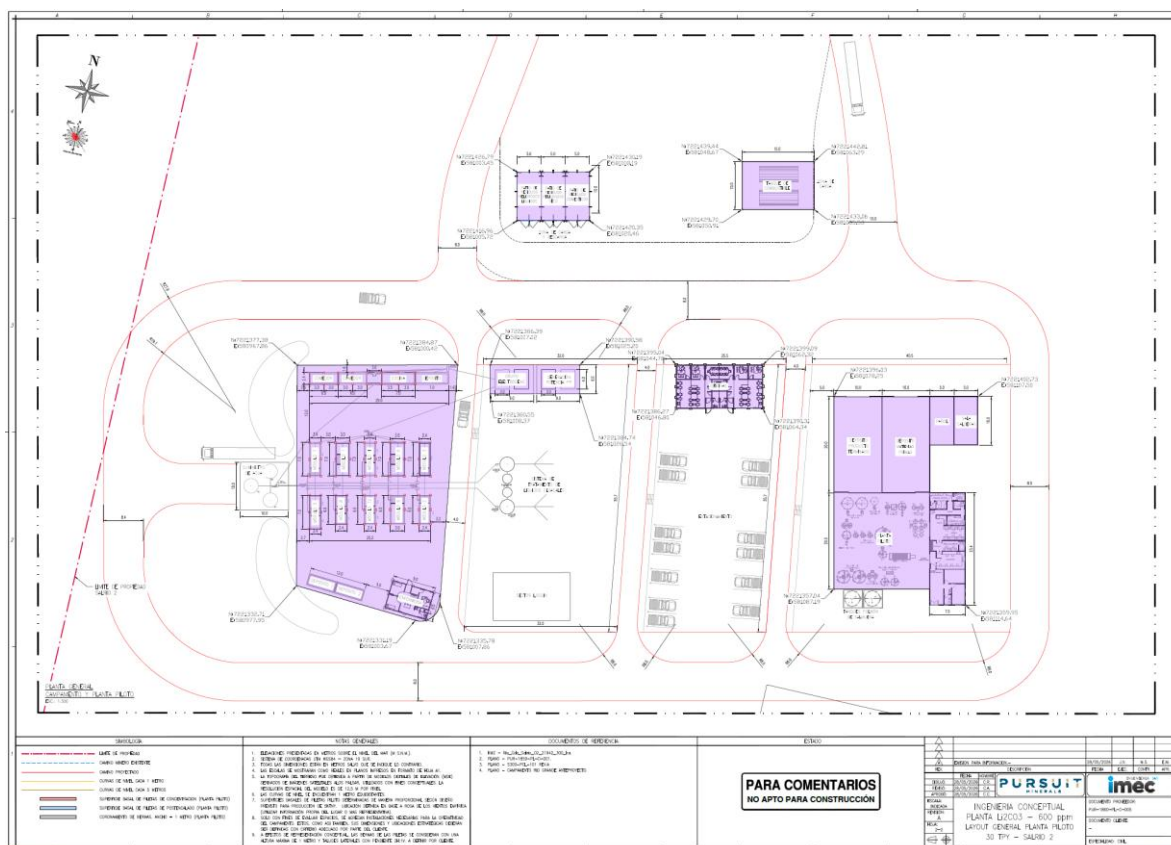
Rio Grande Sur Pilot Plant Site Infrastructure Layout
